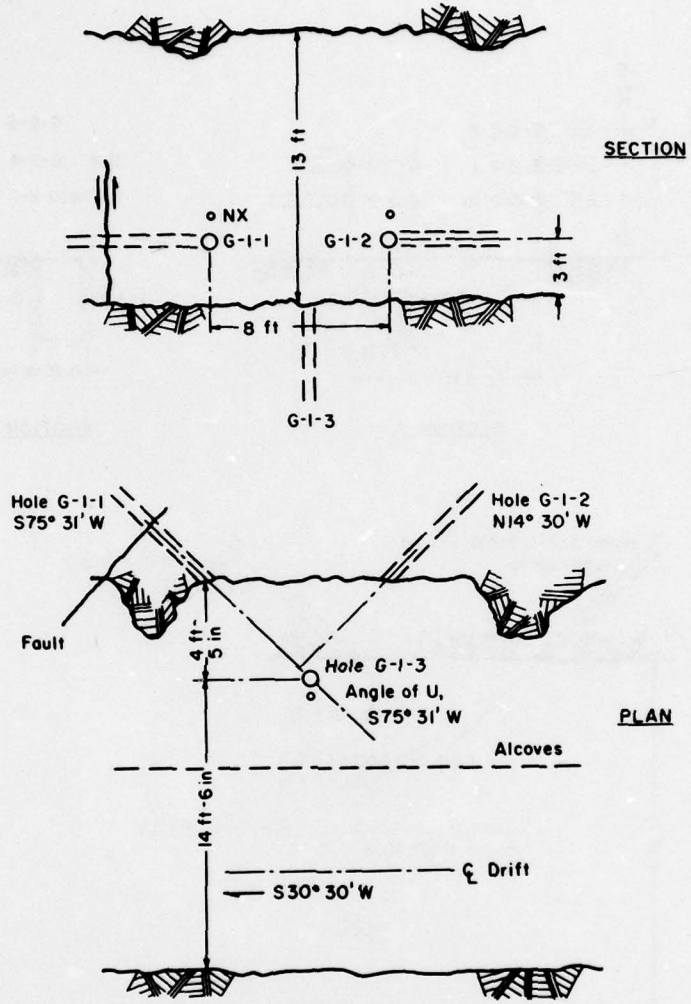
Detail plan and section of site 1 -- tunnel G - drift G.01
